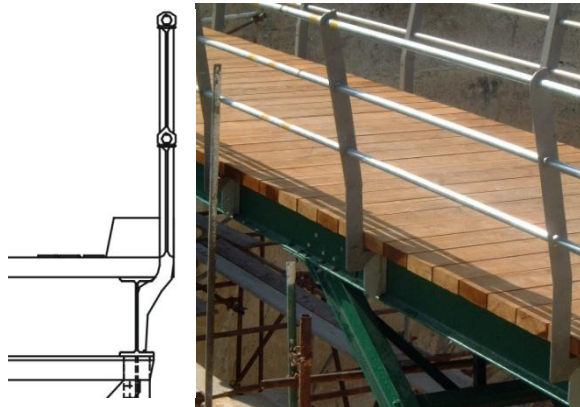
(i) Detail of Fir decking. (Note the temporary railing system installed for safety purposes) (ii) Detail of the edge of the bridge, i.e., the railing, oak kerb, and iron strips fixed over the decking.
